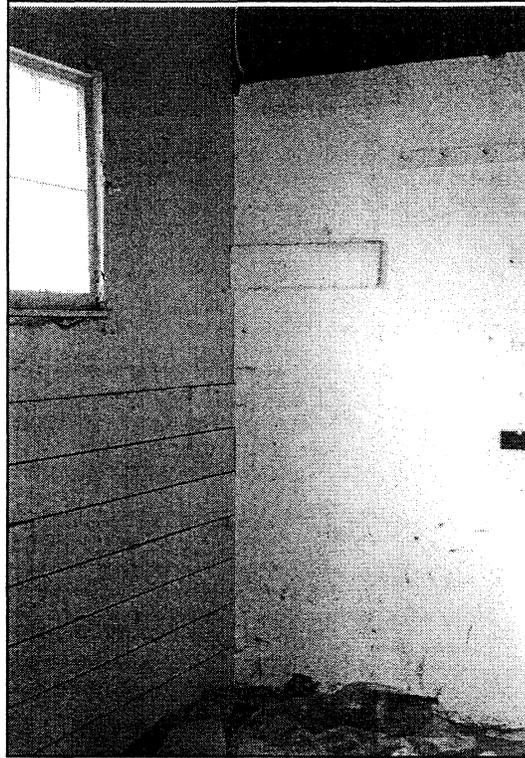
STORAGE AREA SHOWING 1950S HORIZONTAL BOARD-AND-GYPSUM WALLBOARD CLADDING ON SOUTH PERIMETER WALL, INSTALLED DURING USE OF THE BUILDING AS A STORAGE FACILITY (PHOTOGRAPH BY JANET PARKHURST, JANUARY 2005).
